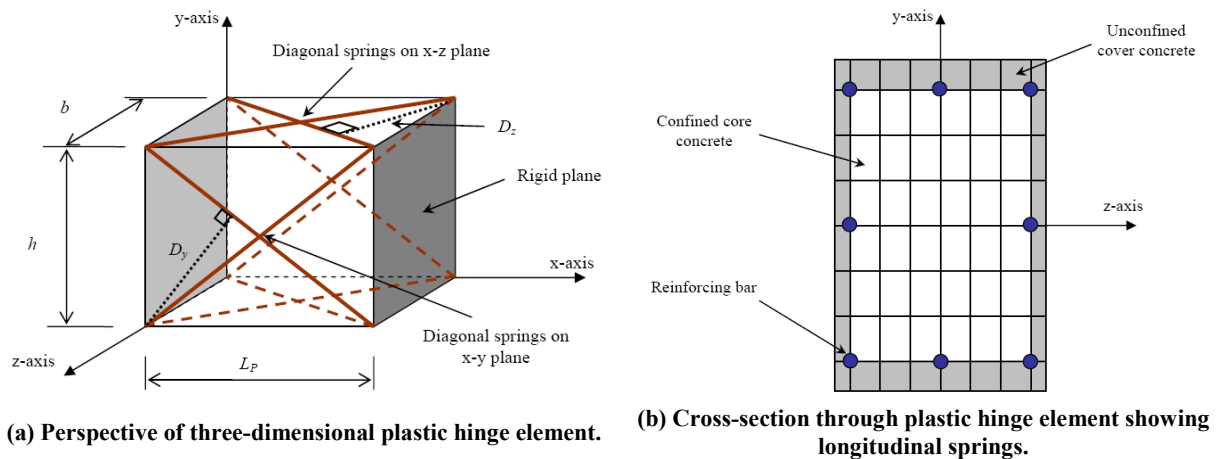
Traditional reinforced concrete plastic hinge element developed by Peng (2009).
